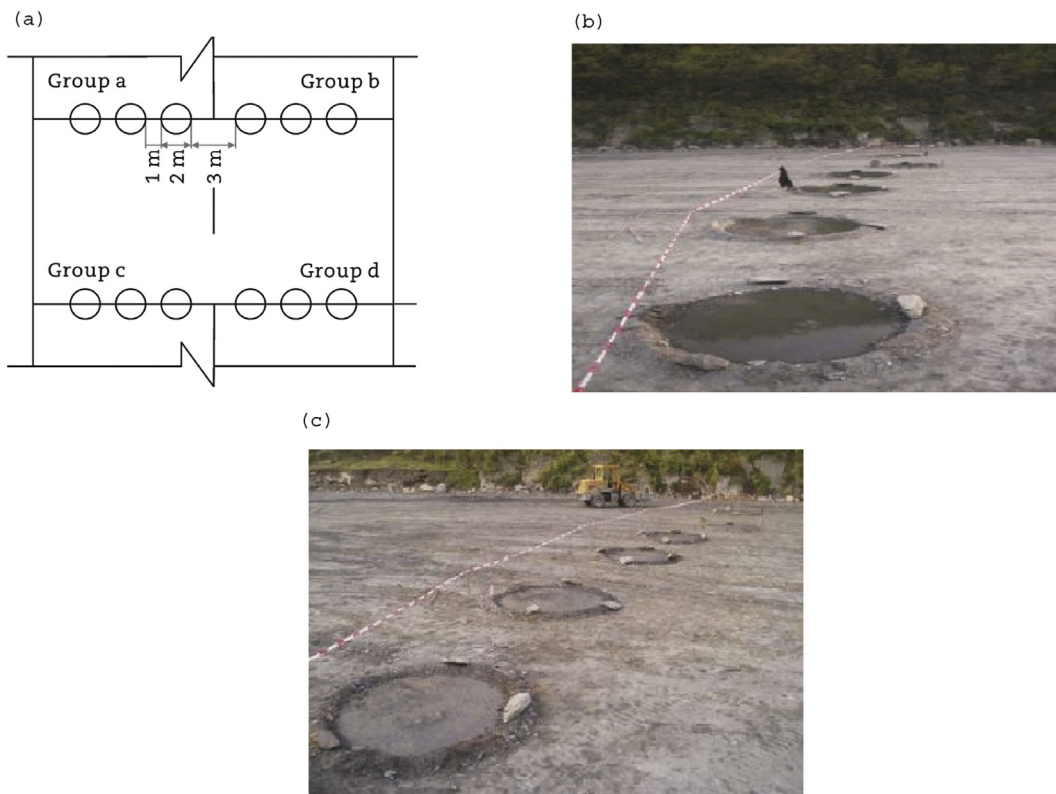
Plan view of test layout. (a) Test layout. (b) Water addition. (c) After soaking.
